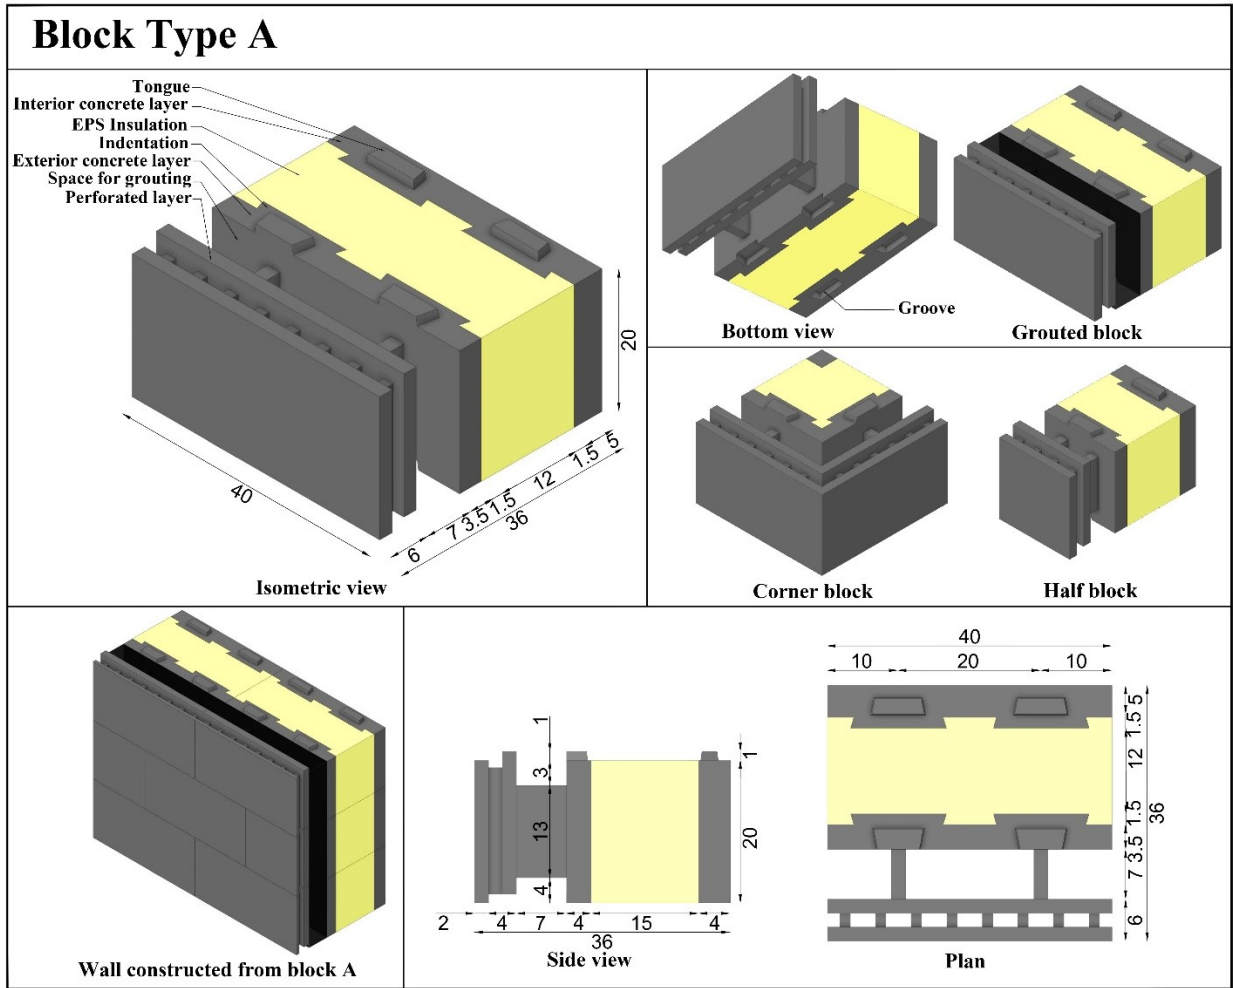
Configuration of Block A, corner and half blocks of type A, and wall A
